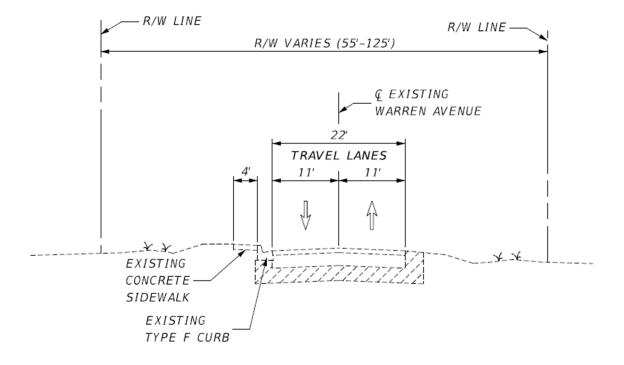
Existing Typical Section from 385 ft East of St Laurent St to 140 ft West of Lemon Lane
